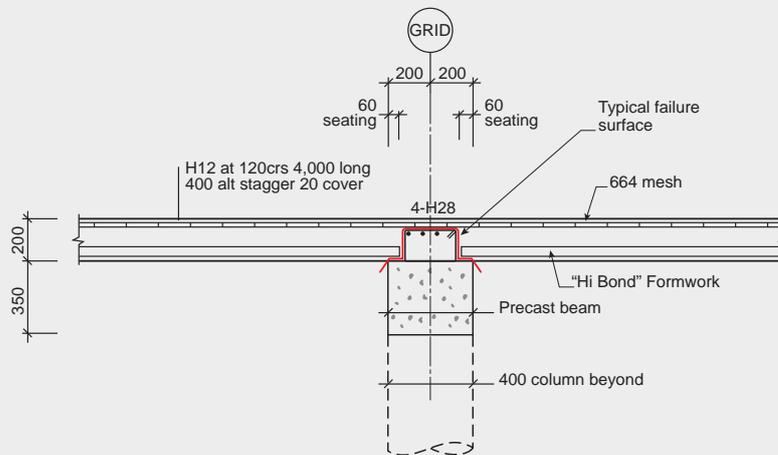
(c): Section through precast internal beam to slab with typical observed failure surface indicated in red
